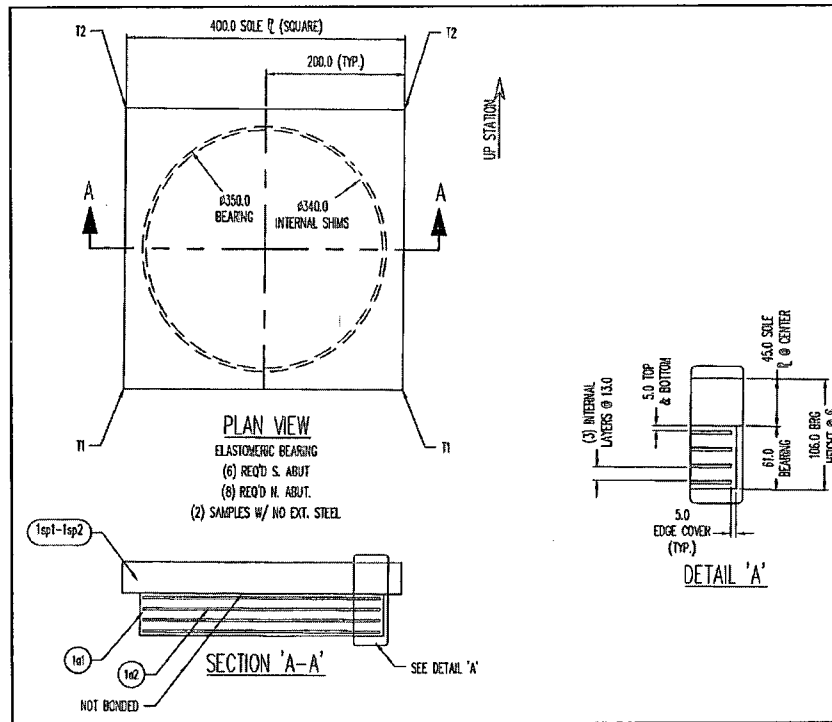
Elastomeric bearing pad cross sections from shop drawings(DS Brown, 2008).
